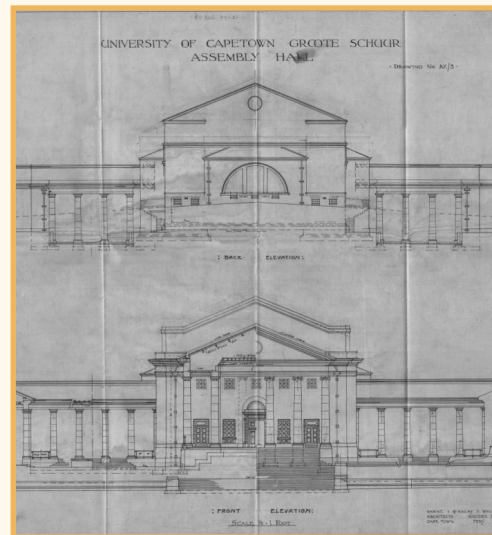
Original architectural drawing of Memorial Hall. Photograph provided by David Gibbs.
